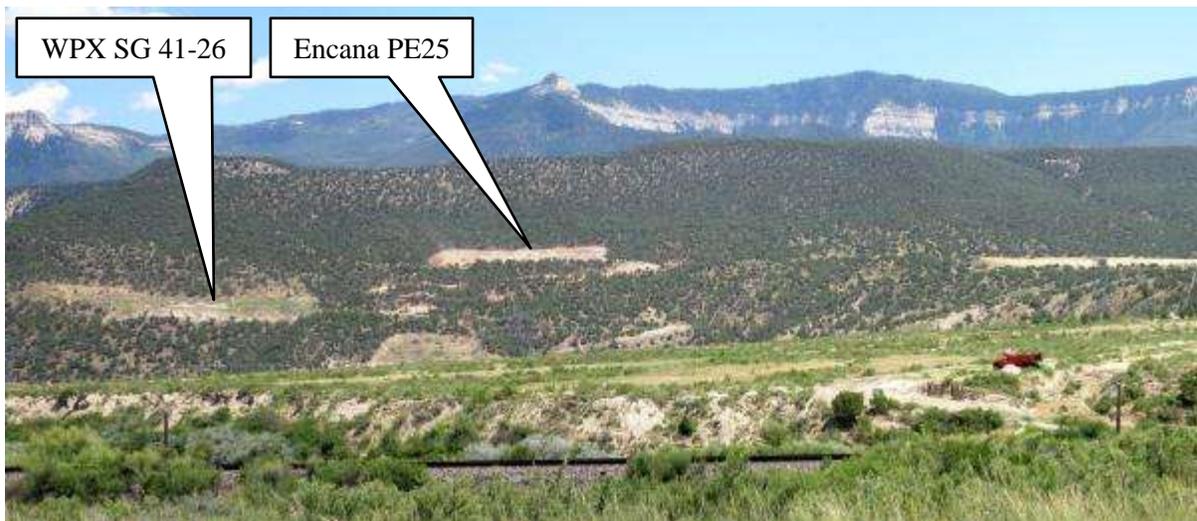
Encana PE25 Access Road and Well Pad Construction from KOP 2 (Photo 2011)
